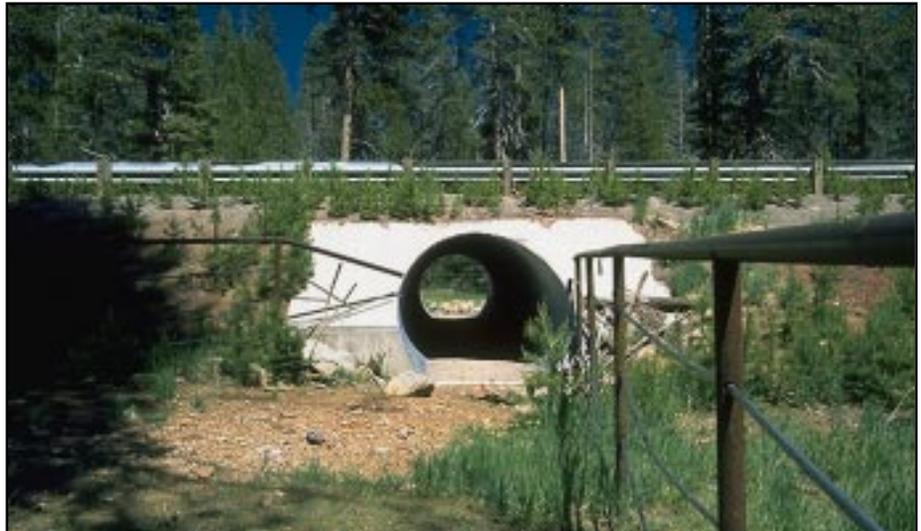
A road underpass constructed to allow animals to move safely from one side of the highway to the other.
